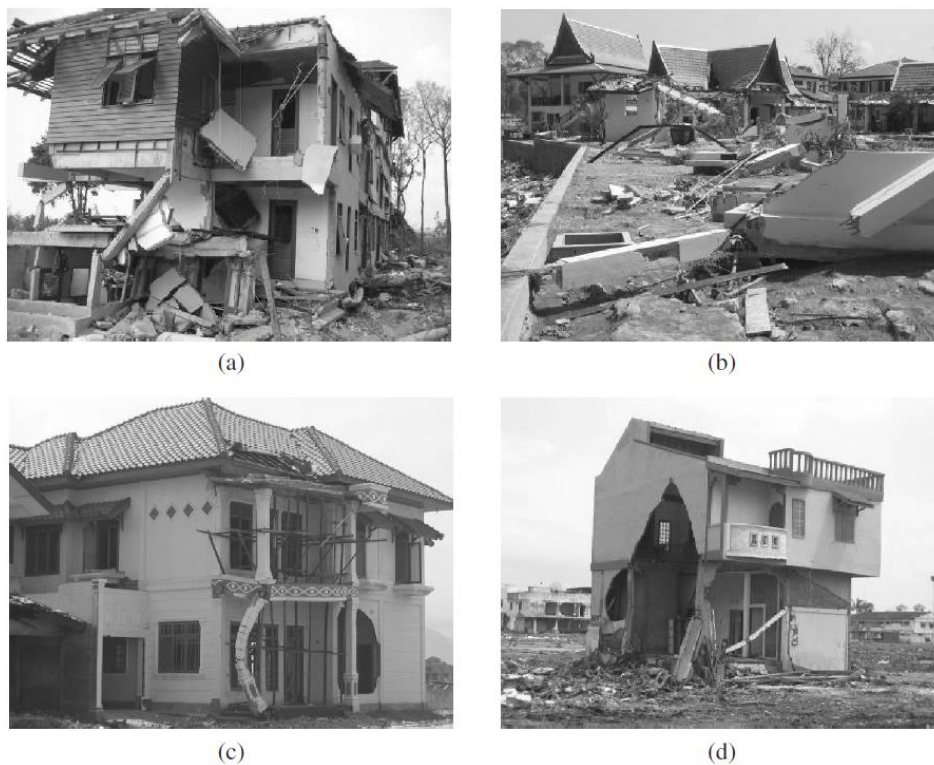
Tsunami damage in Thailand and Indonesia (Indian Ocean Tsunami, 2004): (a) structural damage in Thailand; (b) column failure of RC building in Phuket, Thailand; (c) column failure due to impact of debris in Indonesia; (d) punching failure of infill walls, Banda Aceh, Indonesia.
